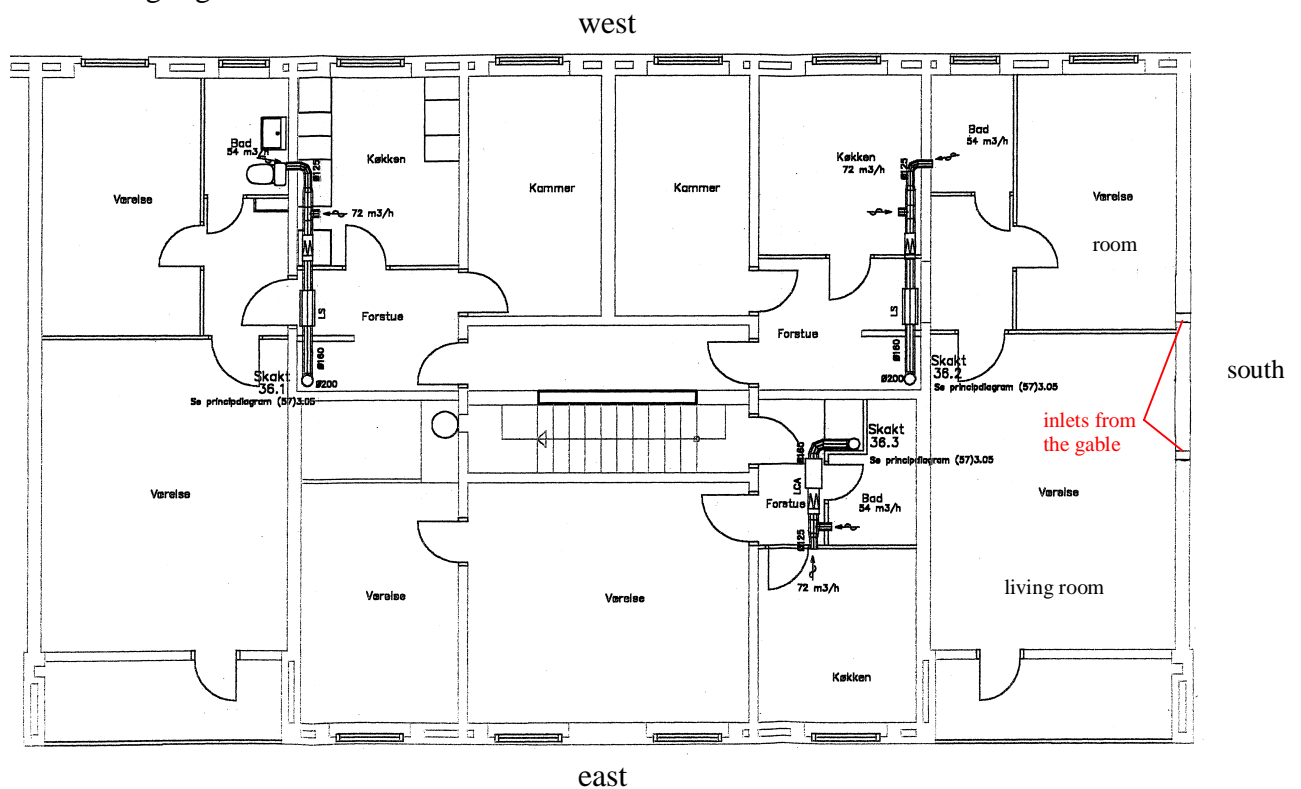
Plan of the apartments of one floor in no. 36 with exhaust ventilation.
